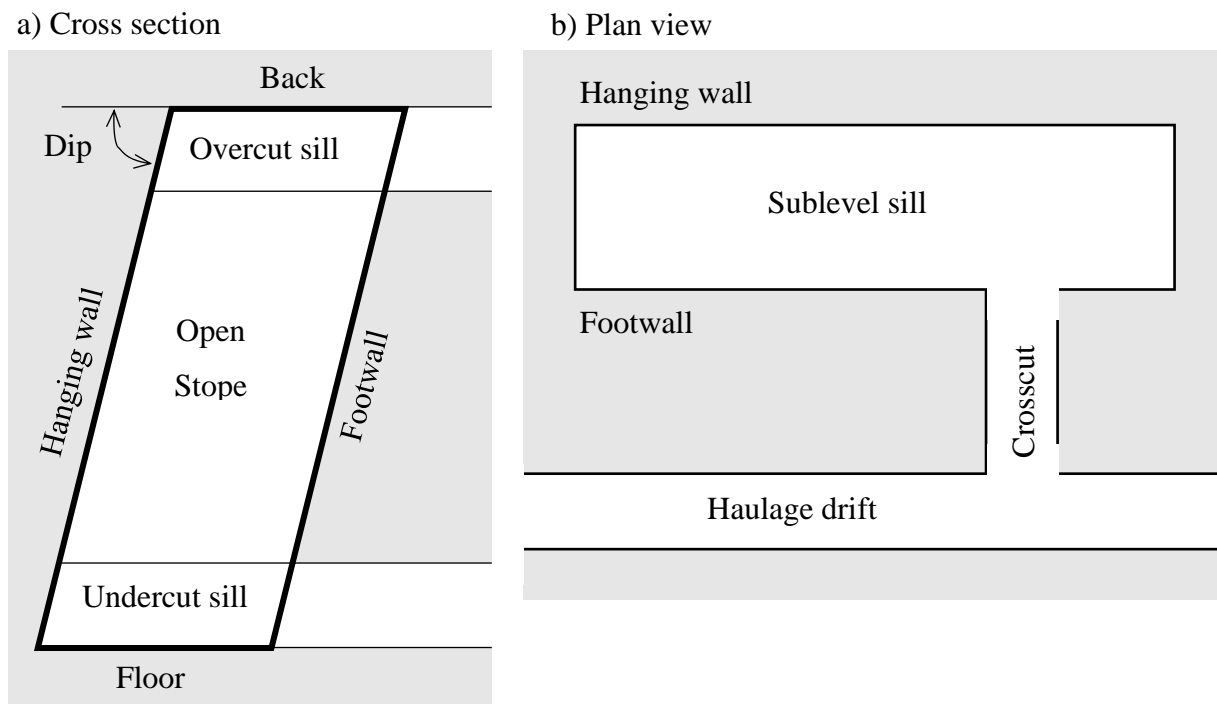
Labelled schematic (a) cross section and (b) plan view of an open stope.
